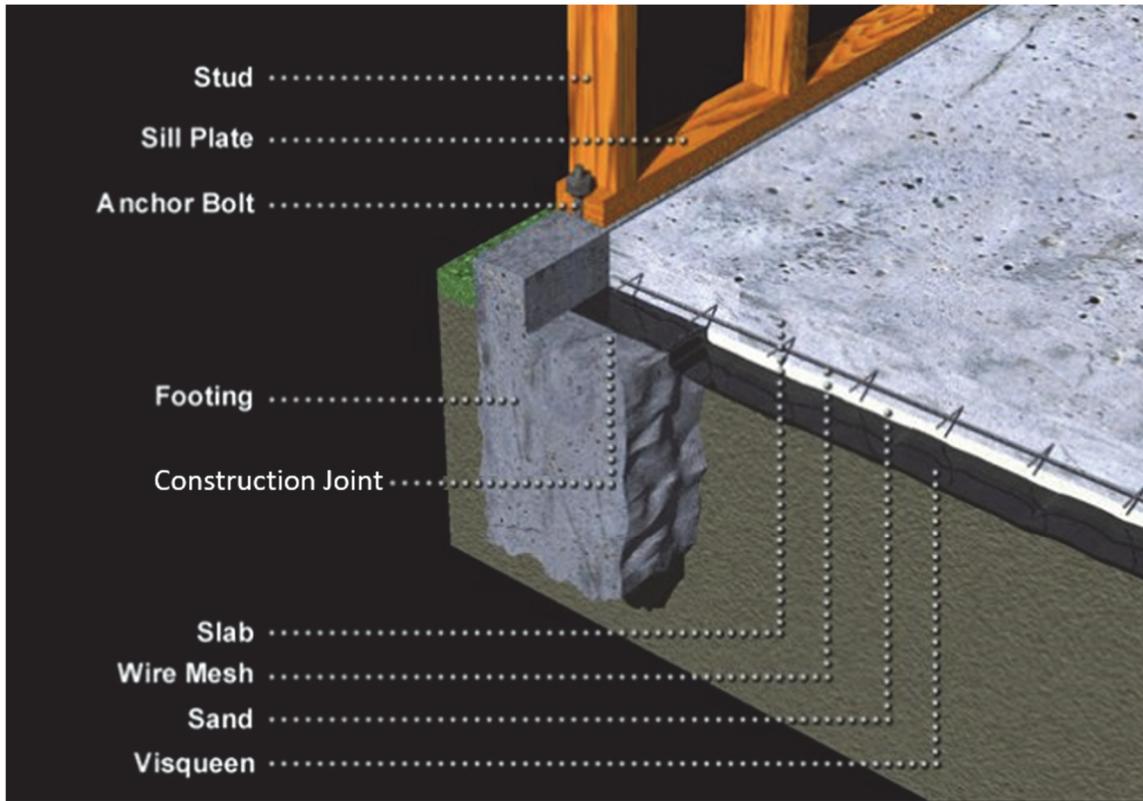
Slab-on-grade with independent perimeter footing and vertical construction joint—two-pour system (image credit: Exponent).
